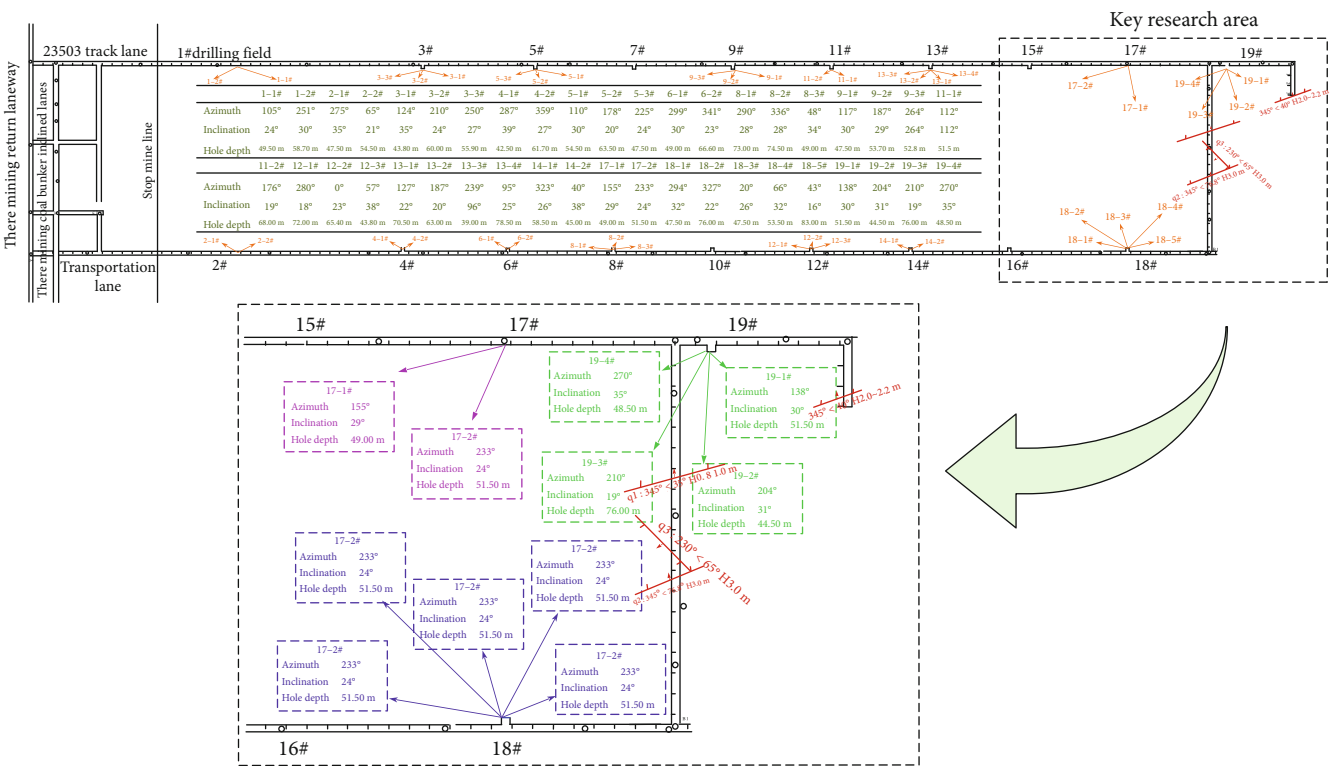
23503 working face floor drilling and grouting diagram.
